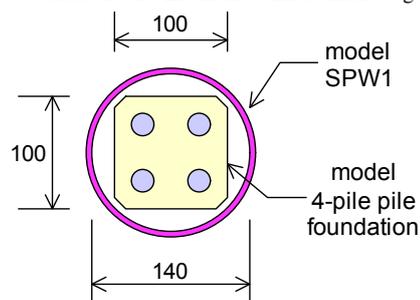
Top view dimensions of SPW reinforcement in VLTs on 4-pile pile foundation.
